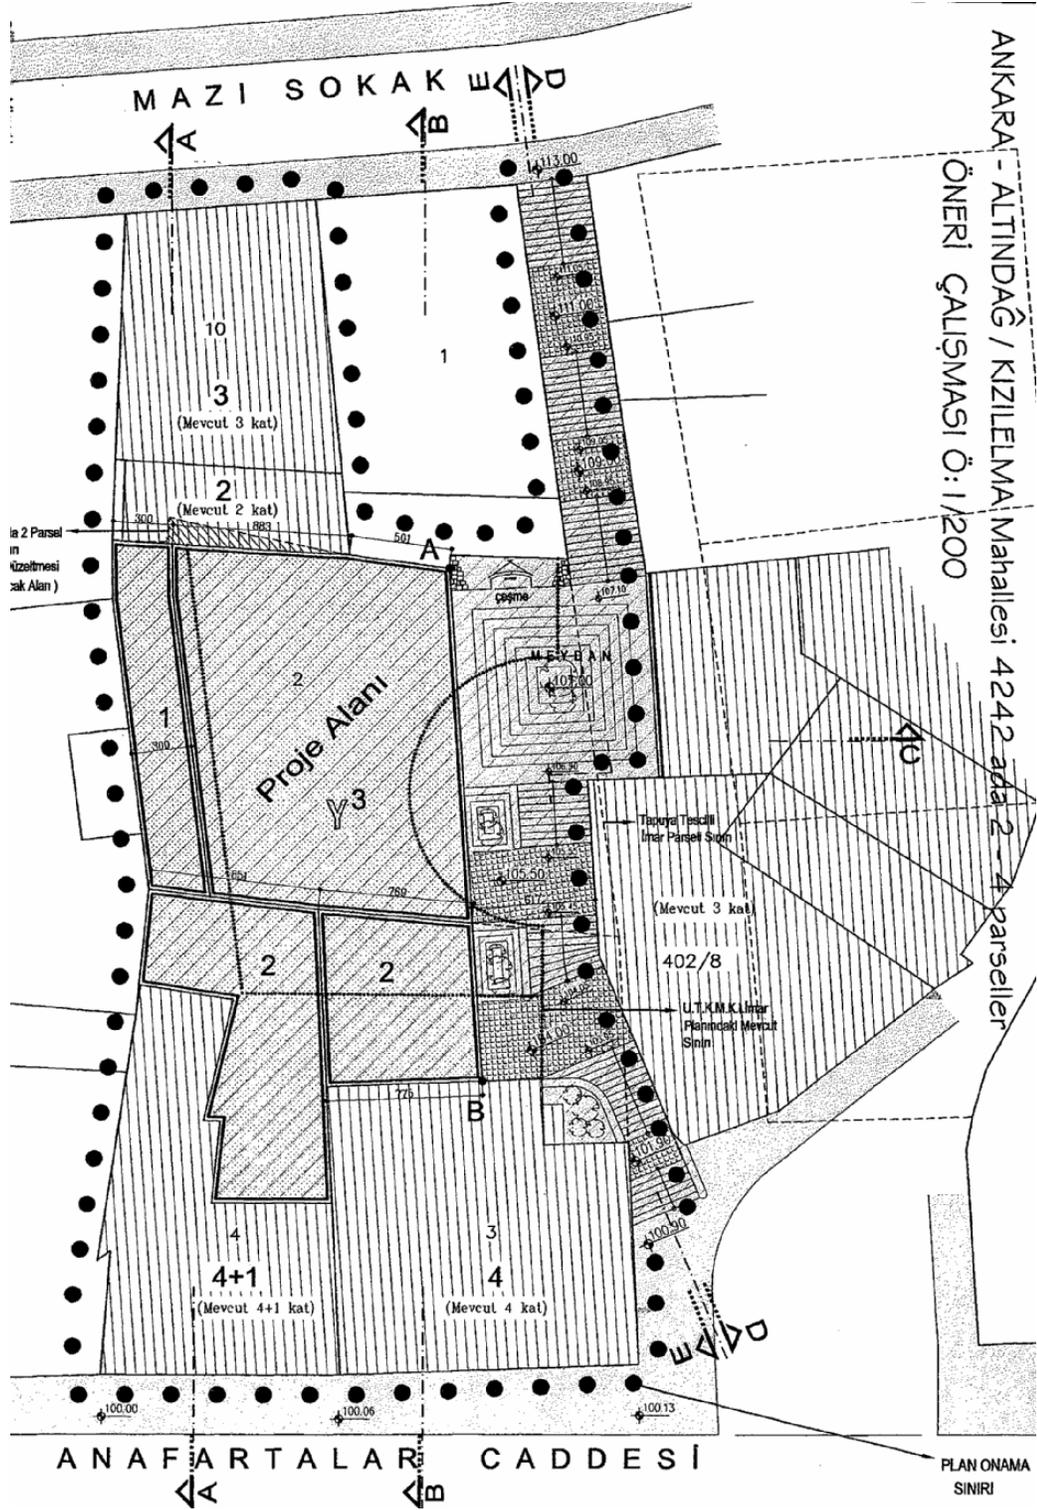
4242 Construction Block 2- 4 Proposed 1/200 scale Plan (Source: Mine Karataş)
